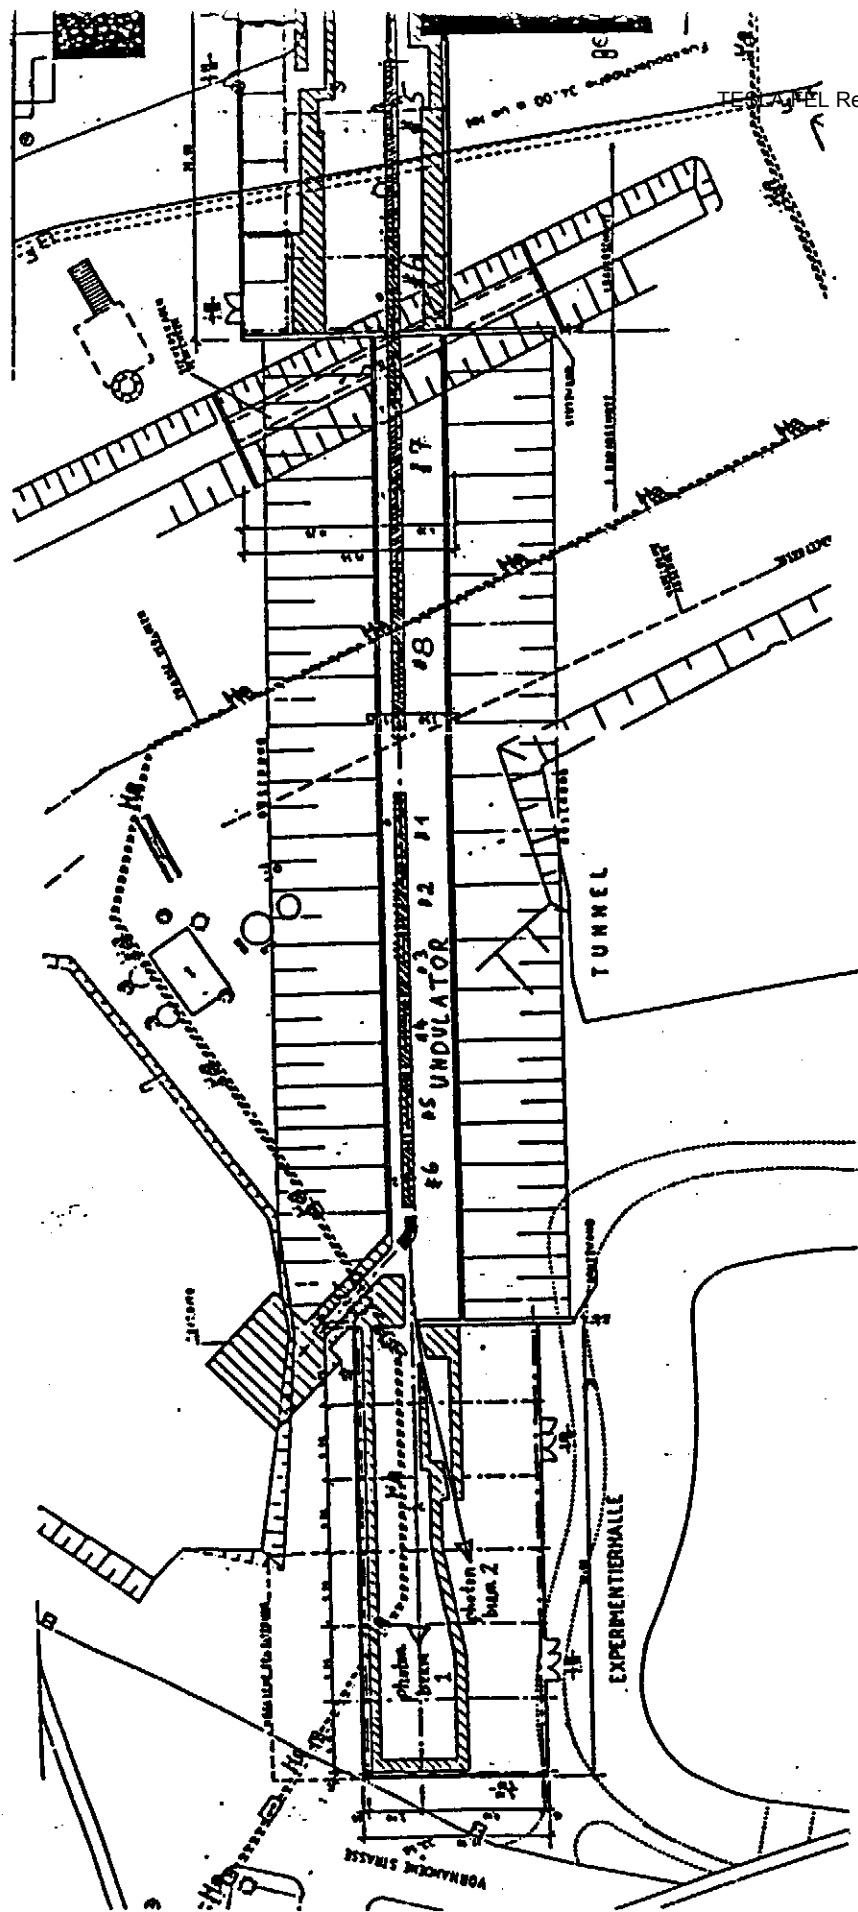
Layout of the TTF FEL installation on the DESY site.
